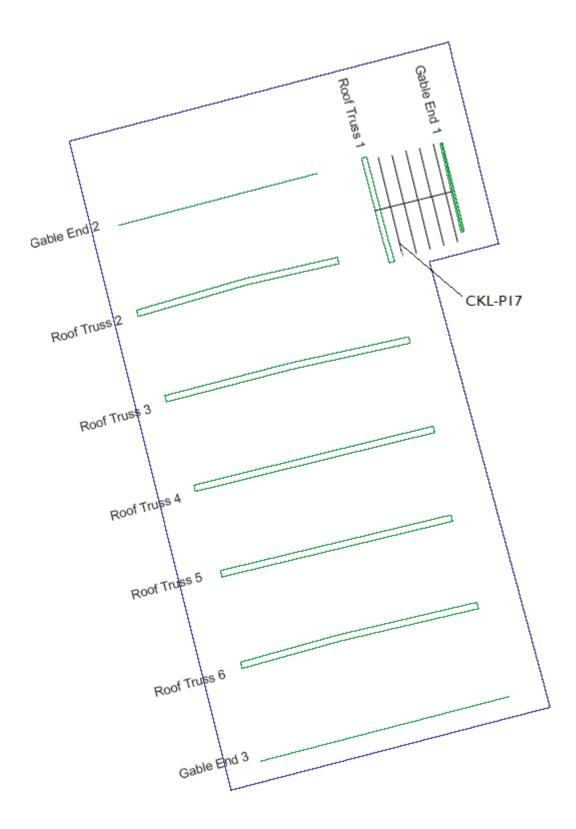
Plan at roof level, showing the location of trusses and the position of sample CKL-PI7 (after lan Wells)
